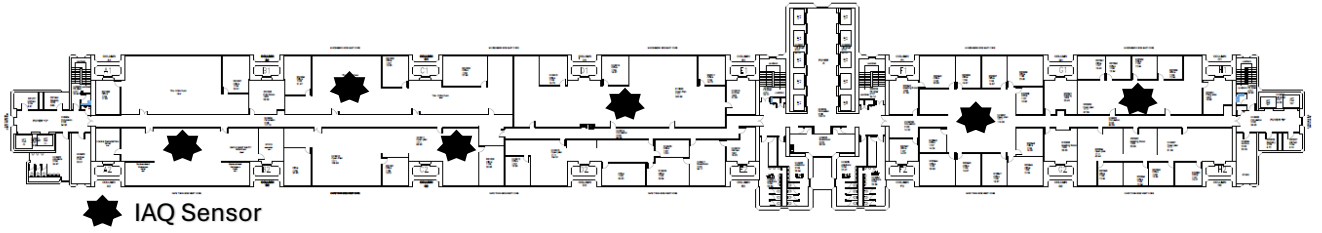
Tower Building proposed sensor positioning 15th floor (6)
